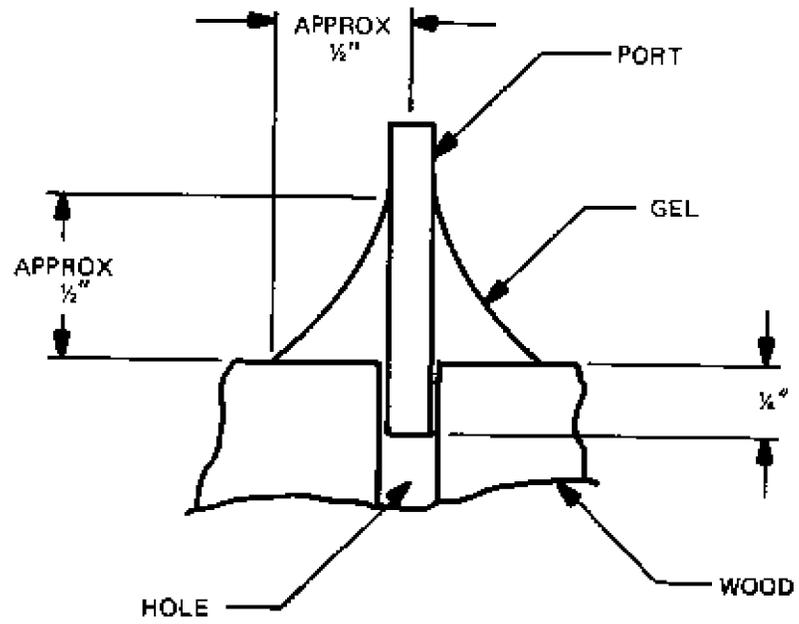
CROSS SECTION SHOWING GEL BUILD-UP AROUND PORT.
